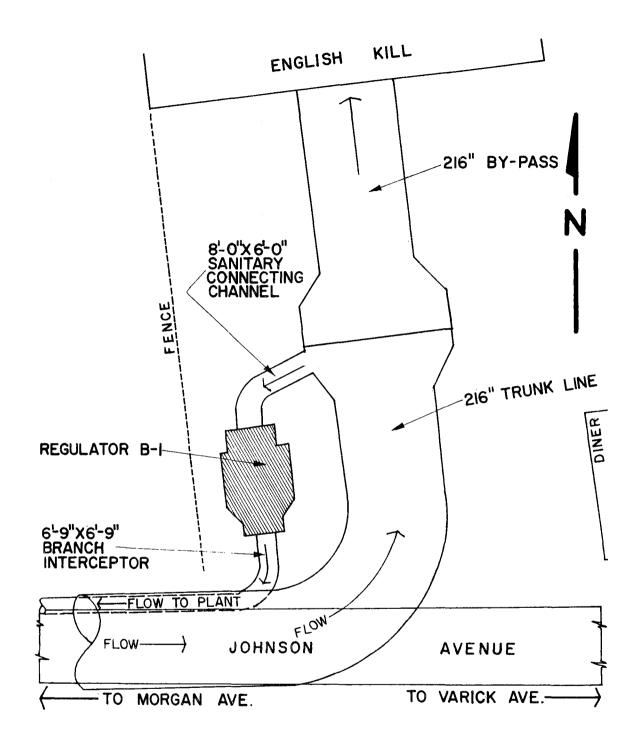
LOCATION PLAN REG. B-I JOHNSON AVENUE EAST OF MORGAN AVENUE
